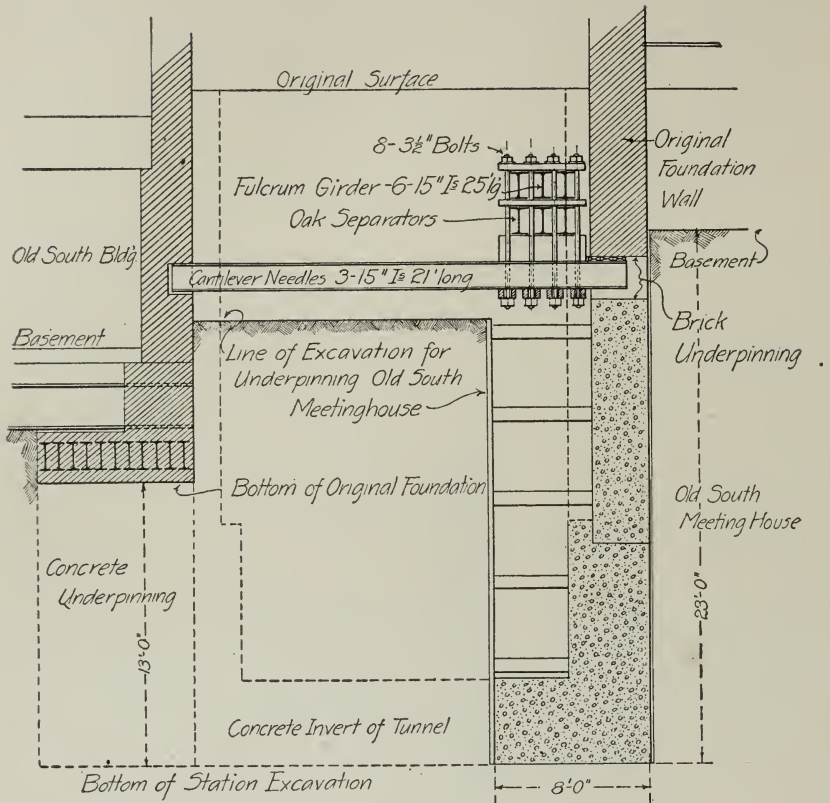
Heavy Needling and Underpinning, Old South Meeting House and Old South Building, Boston.
